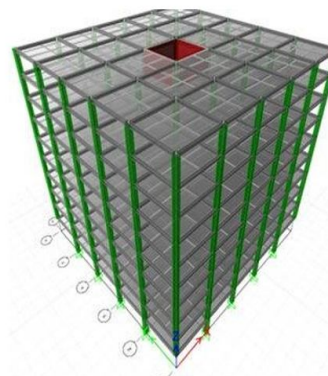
Effects of combining shear walls with filler slabs in a multi- story RC building
